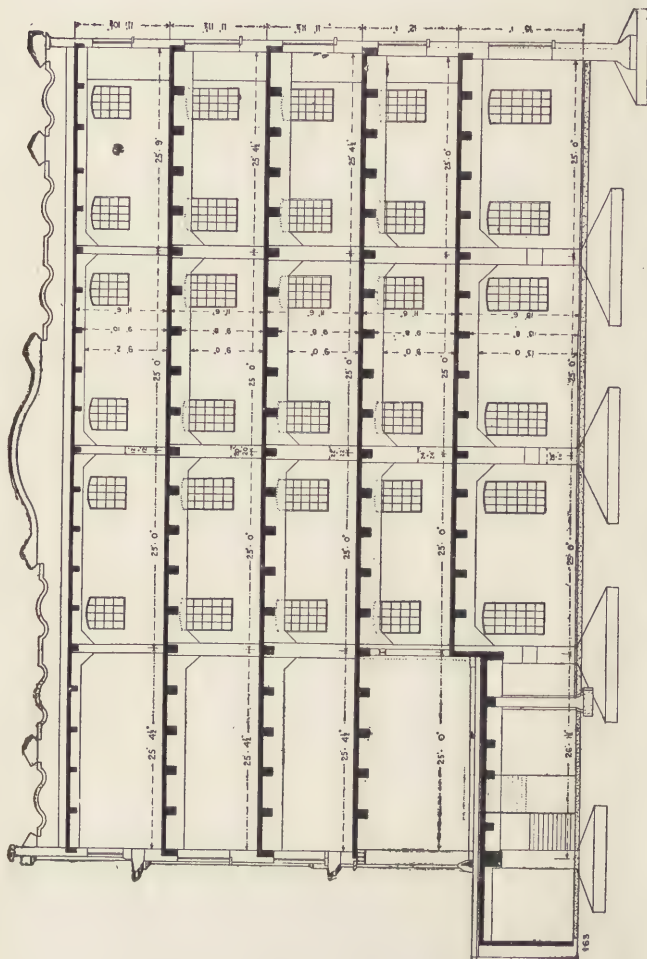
Great Western Railway Stationary Warehouse (Section).
